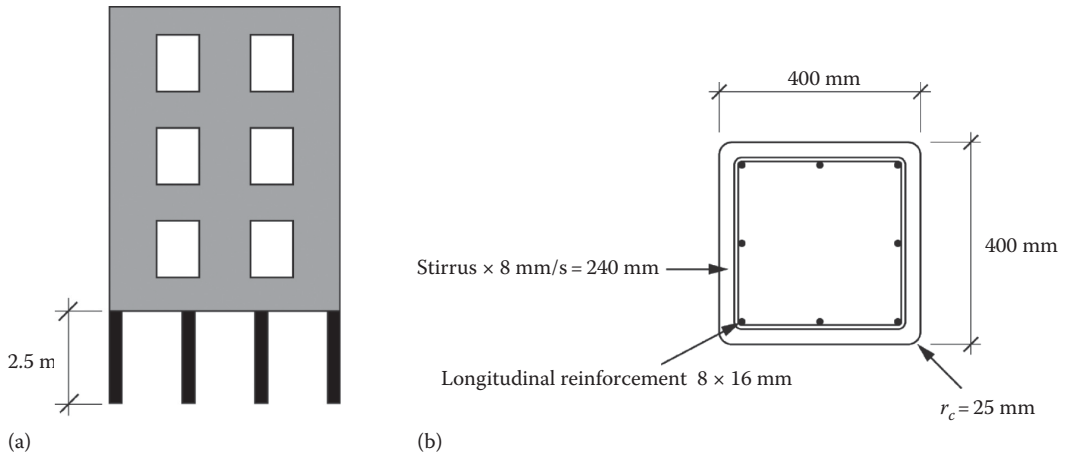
Example of a square reinforced concrete column to be retrofitted with FRP wraps: (a) example of columns at ground floor and (b) section and reinforcement of example column.
